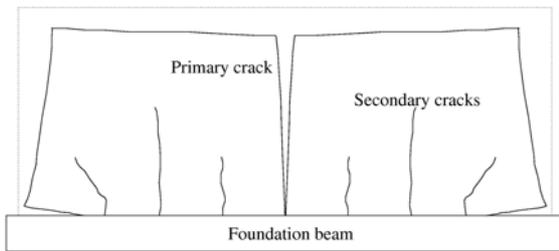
General crack pattern in base-restrained shrinking wall [7]
